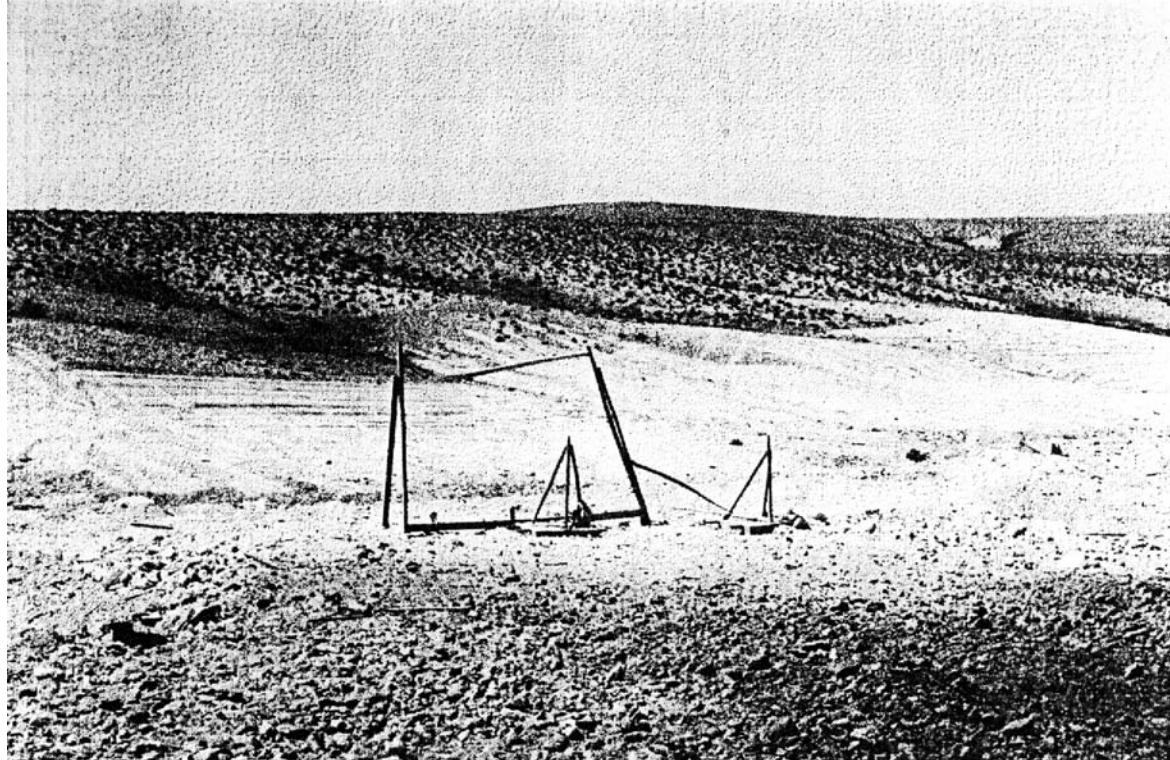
Wall panel 35m and 67.5m from the C.O.E.
